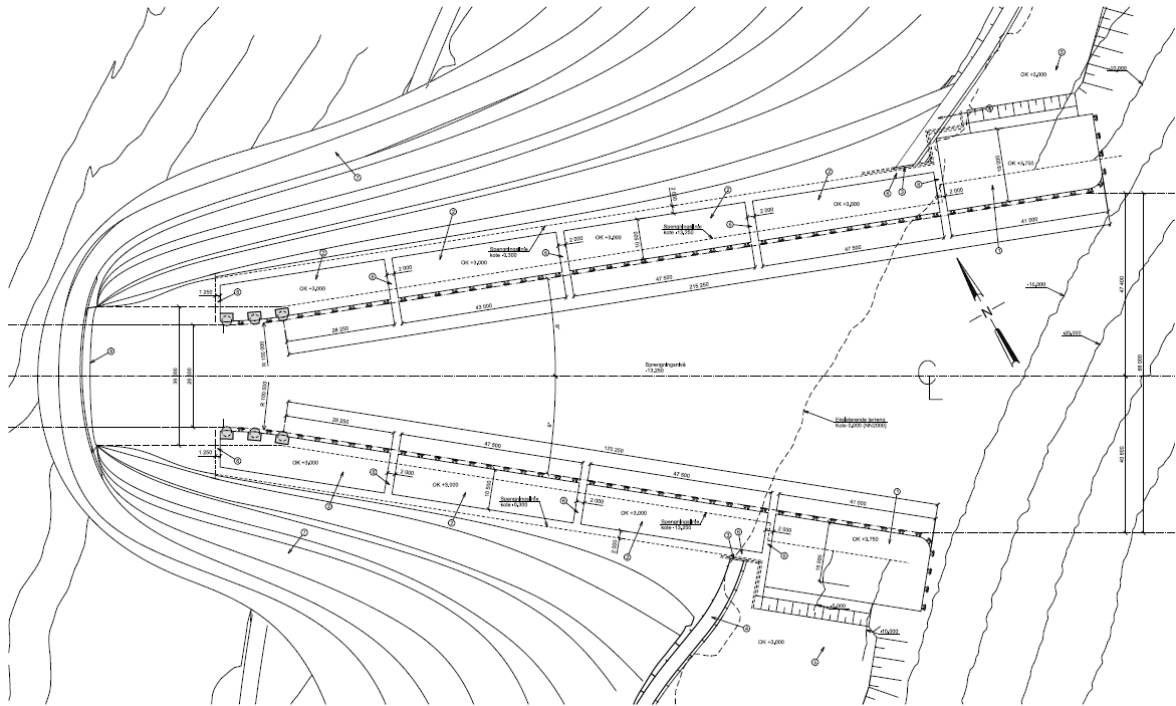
Principle sketch of guiding construction and roof catwalk
